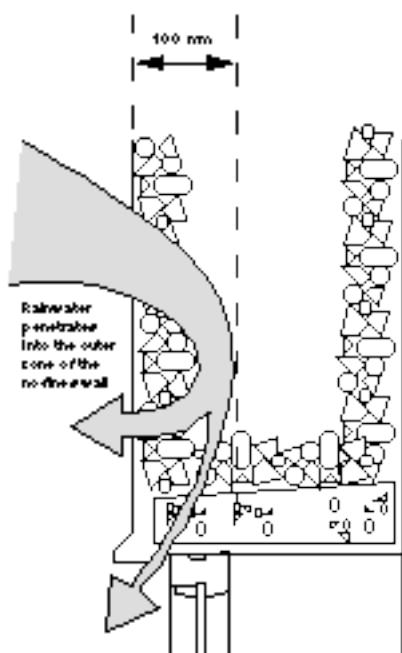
Rainwater penetrating cracks in the external render tends to find its way out again without penetrating through the wall thickness
